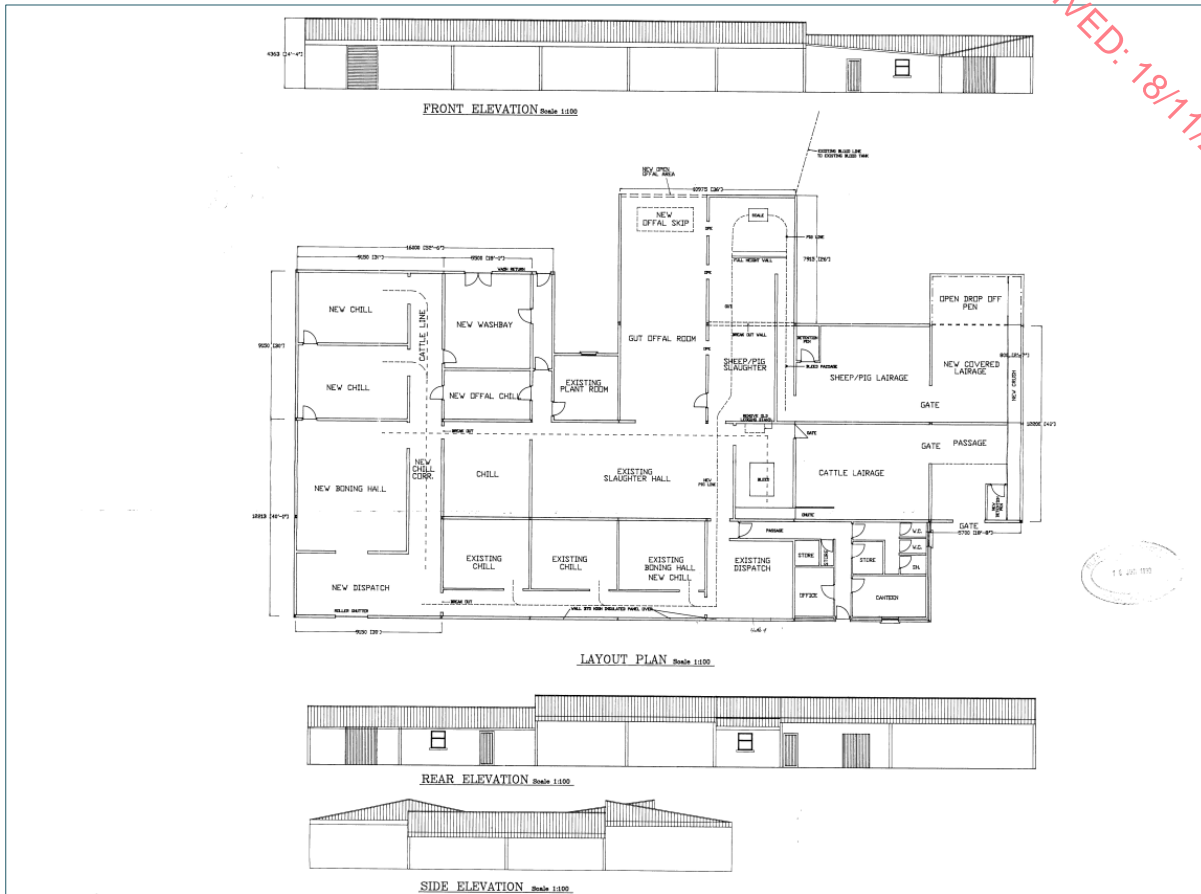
Extract from Ground Floor Plan, Reg. Ref.: 99/2499 [Source: Extract from Ground Floor Plan, Reg. Ref.: 99/2499]
